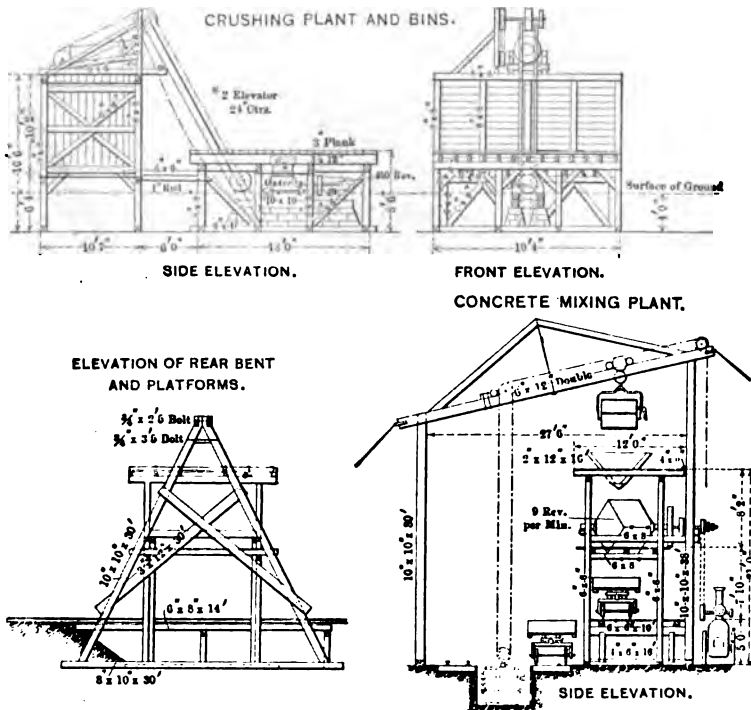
STONE CRUSHER AND CONCRETE MIXER, ILLINOIS AND MICHIGAN CANAL.
